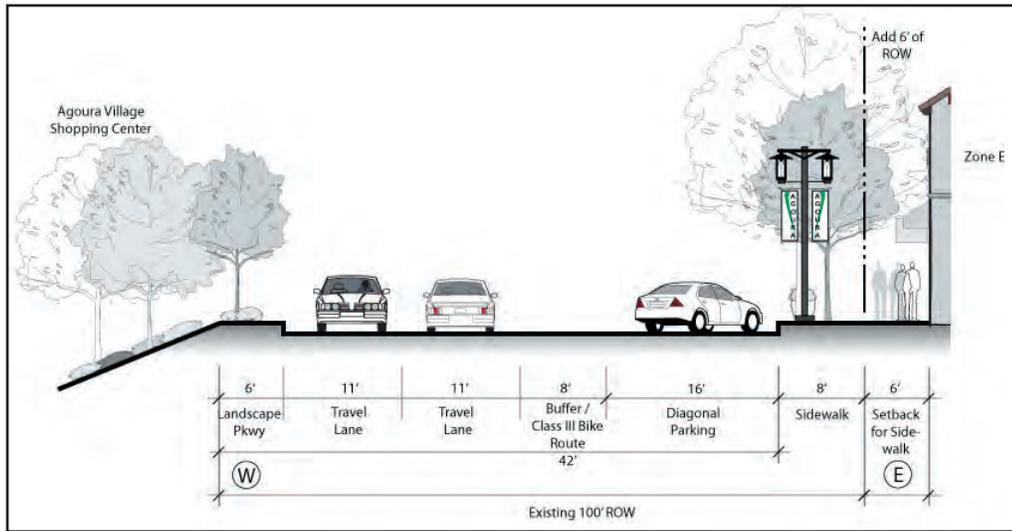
Future Cornell Road street section (south of Agoura Road)
